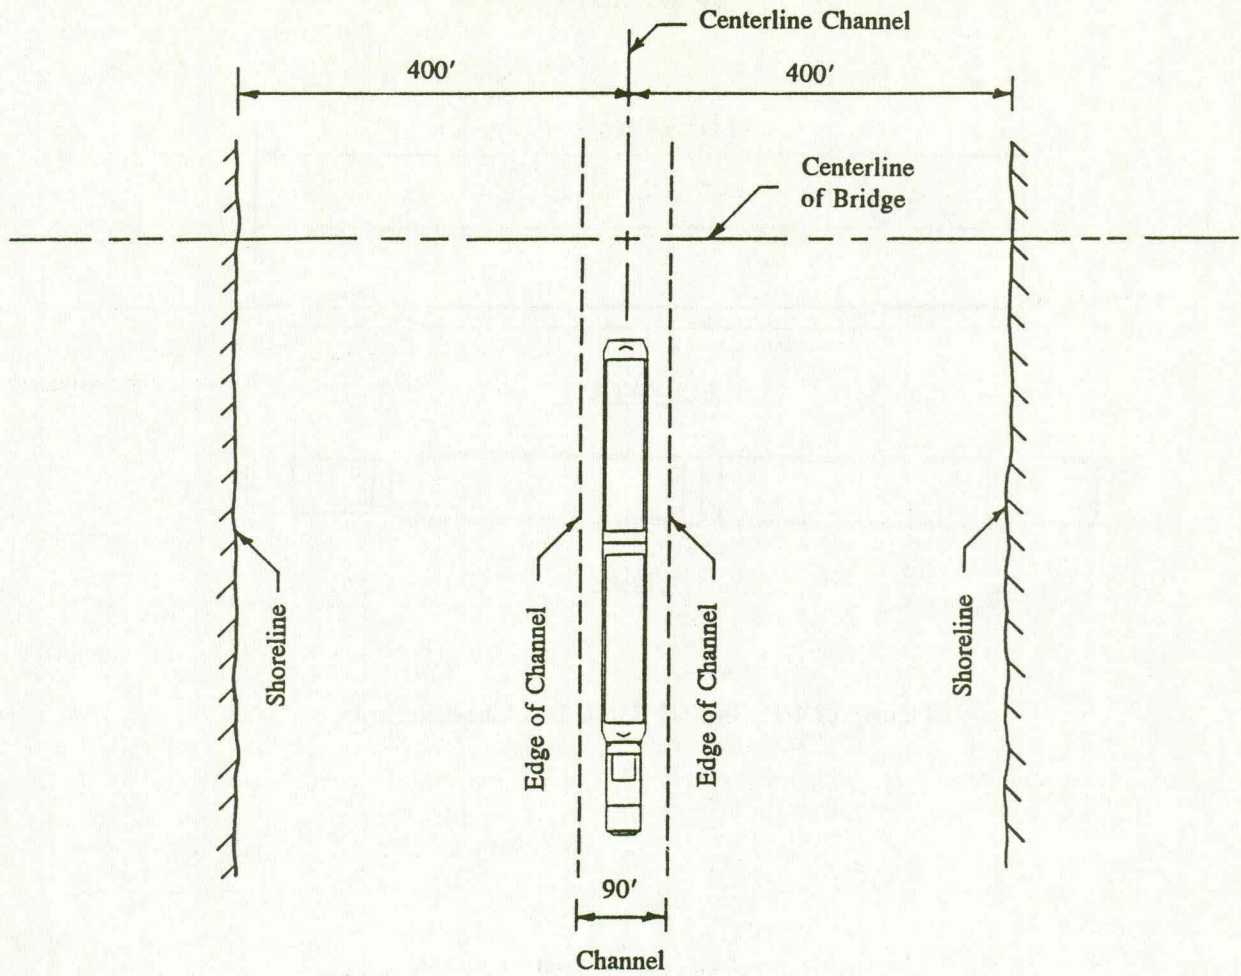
Plan of Waterway/Channel/Bridge Geometry.
